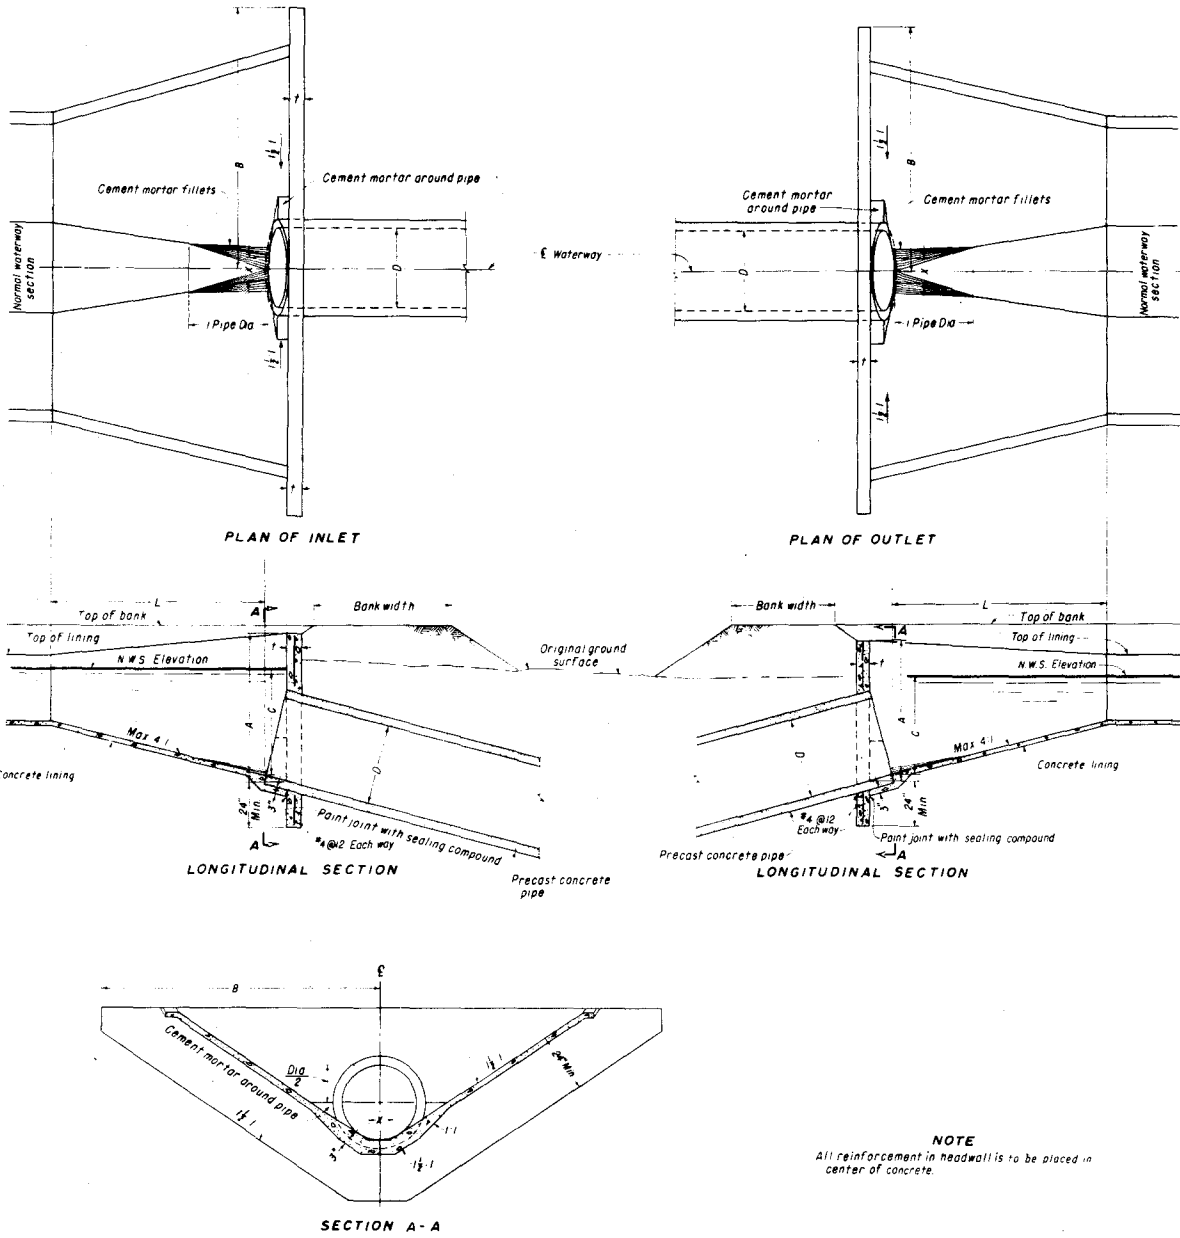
Concrete transitions—type 1. 103-D-1288
